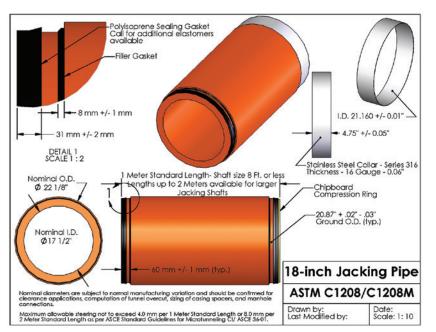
Example Jacking Pipe shop drawing for 18-inch pipe.
